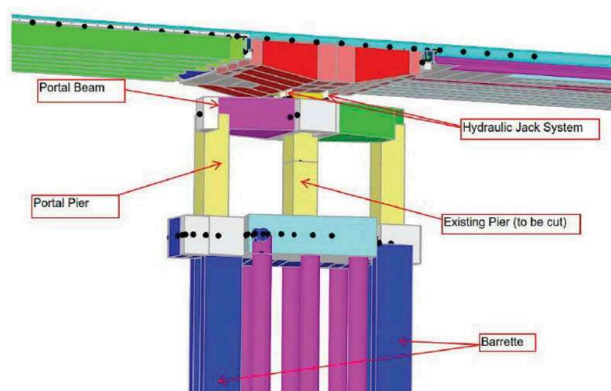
Example section of load transfer system at CH.29+300 by Sap2000.
